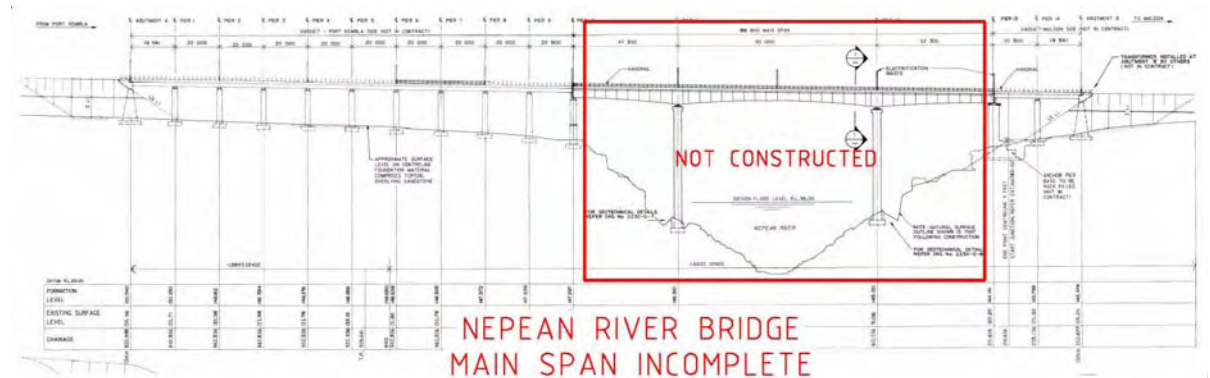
Nepean River Bridge – Original Design showing Area not constructed
